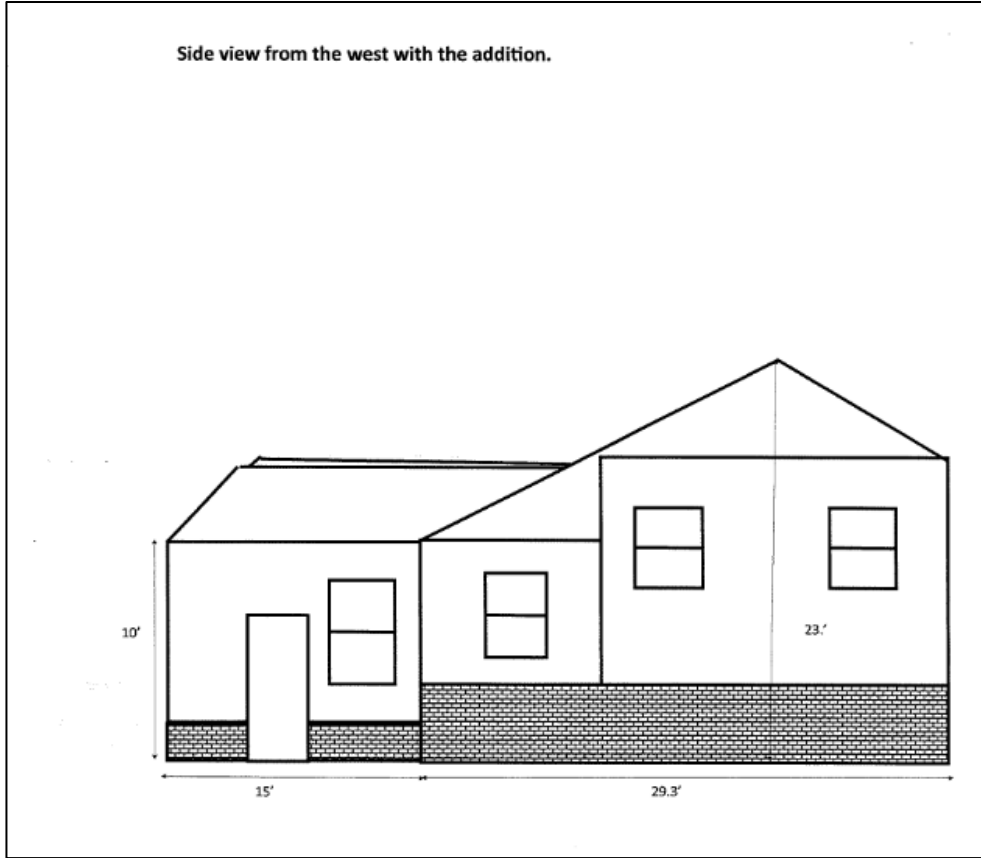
Proposed rear addition seen looking west at 727 Jackson Street.
